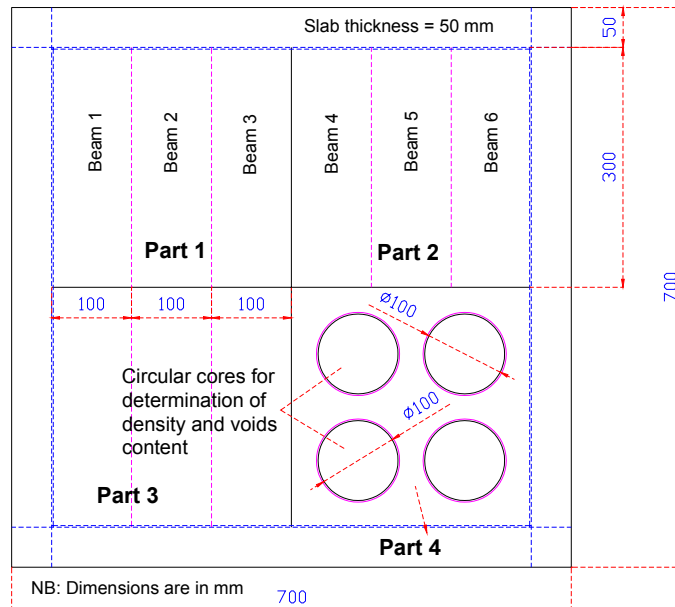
Layout showing beam segments and cores made from the fabricated slab
